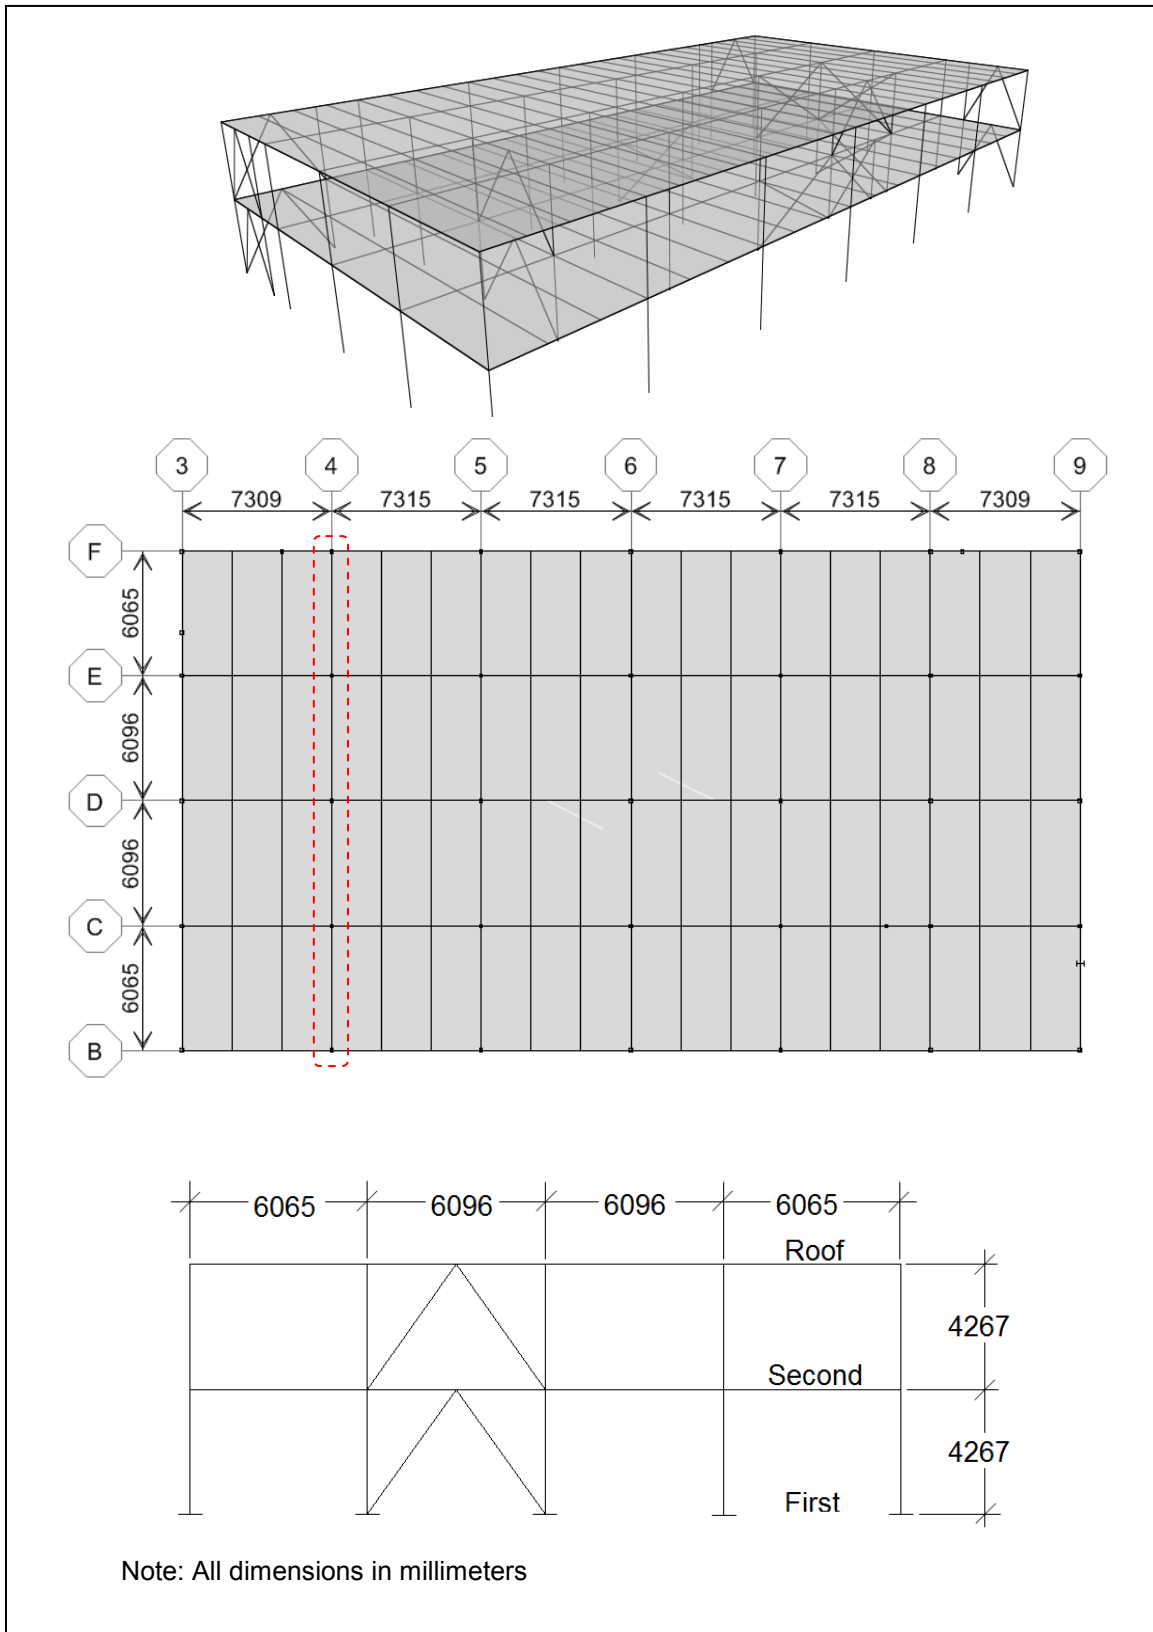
Building BF-1 3D, Plan and Section at Gridline 4
